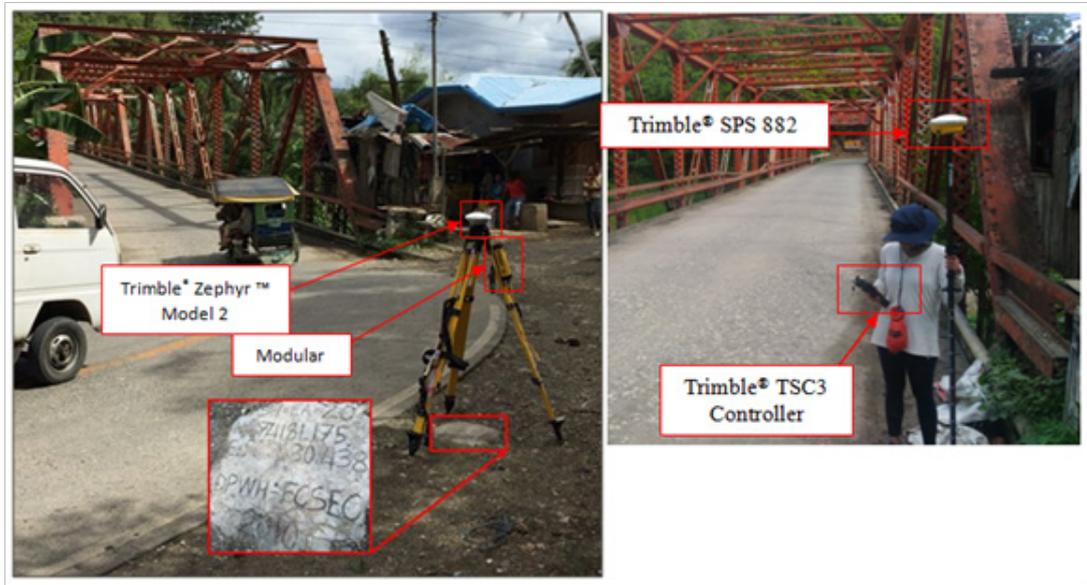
Bridge as-built and cross-section survey of Guinabasan Bridge.
